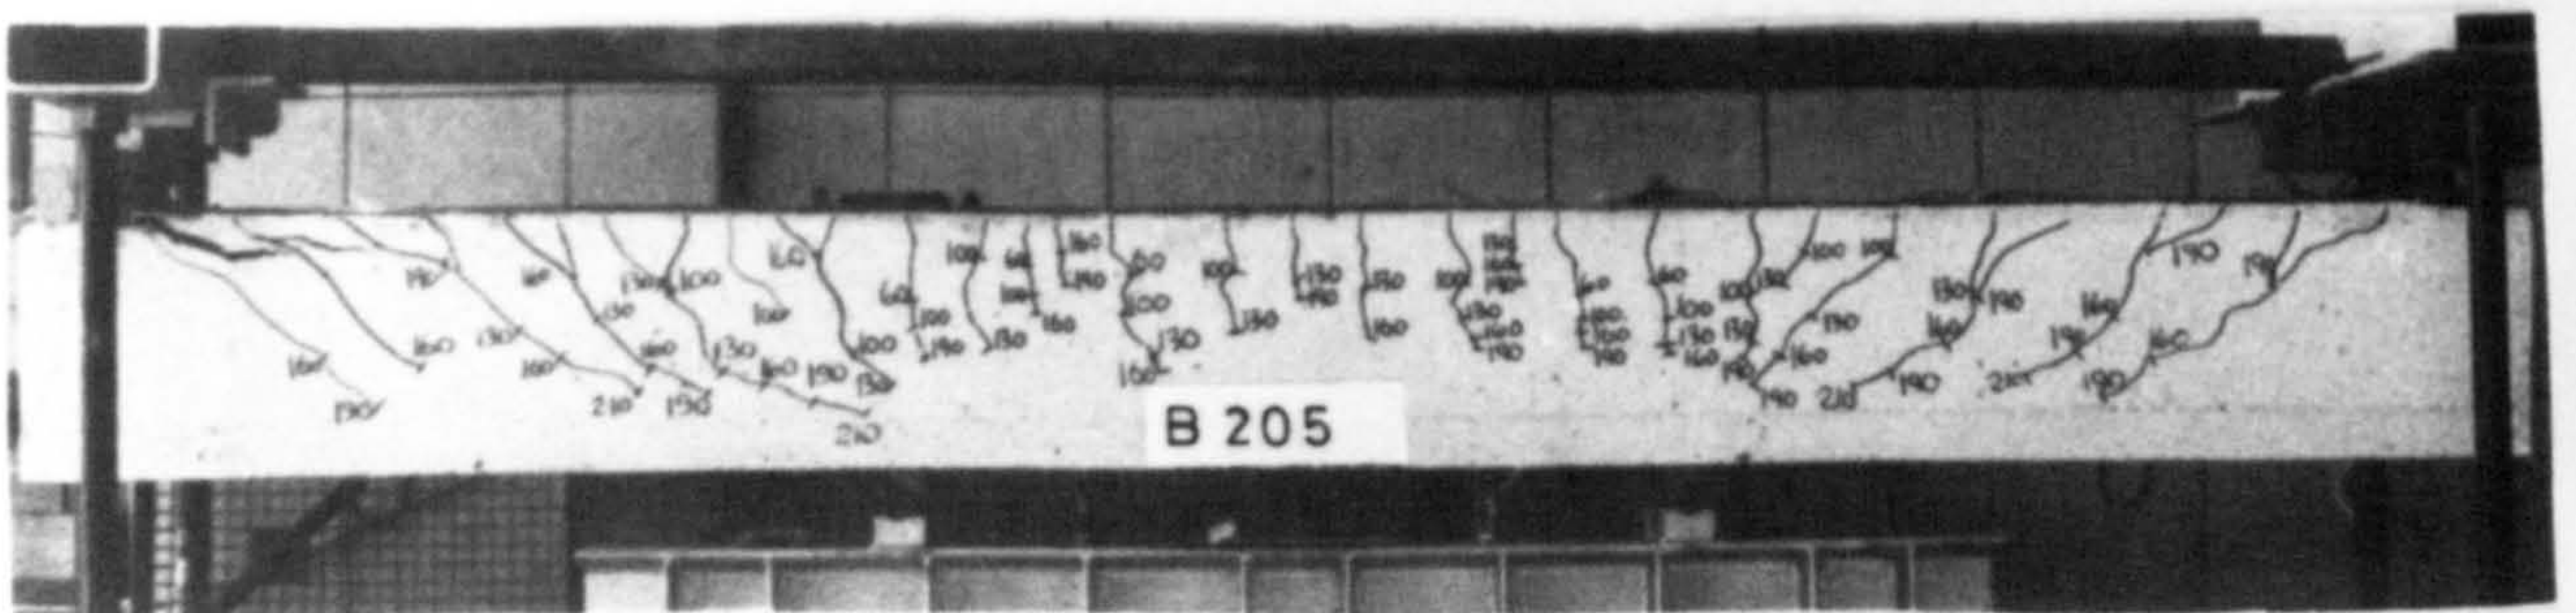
CRACK PATTERNS. - PLATED AND UNPLATED BEAMS
